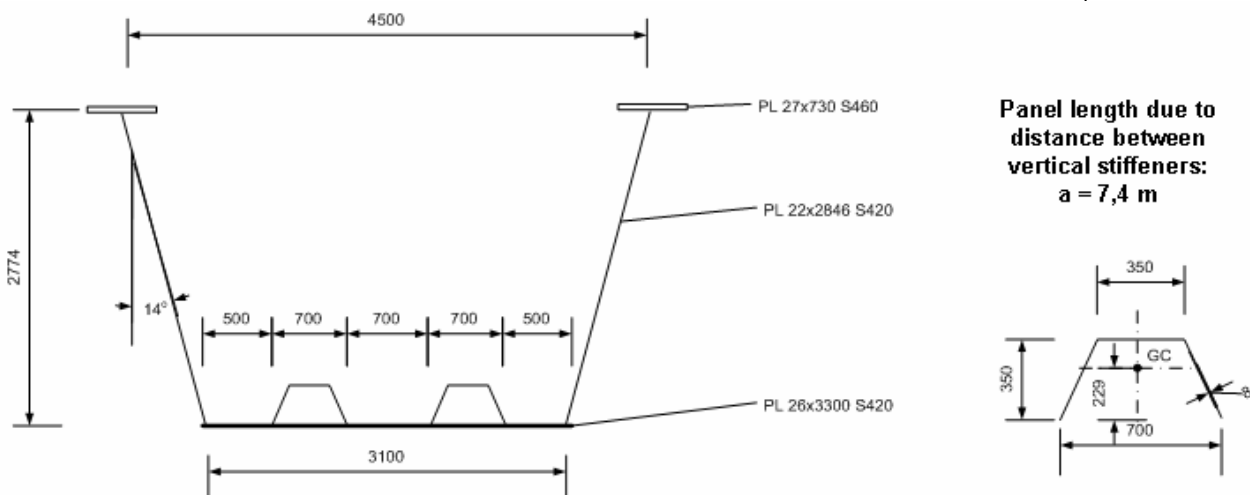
Cross section at pier 2 when the nose reaches pier 3
